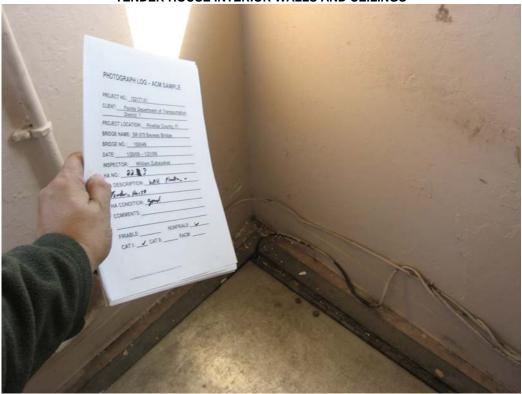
01/21/09 - SAMPLE 22.3 - HA 22 PLASTER TENDER HOUSE INTERIOR WALLS AND CEILINGS
